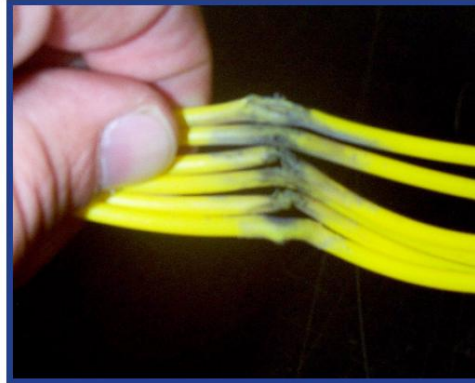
Good "hit" marks on shock tube properly positioned in connector block.
